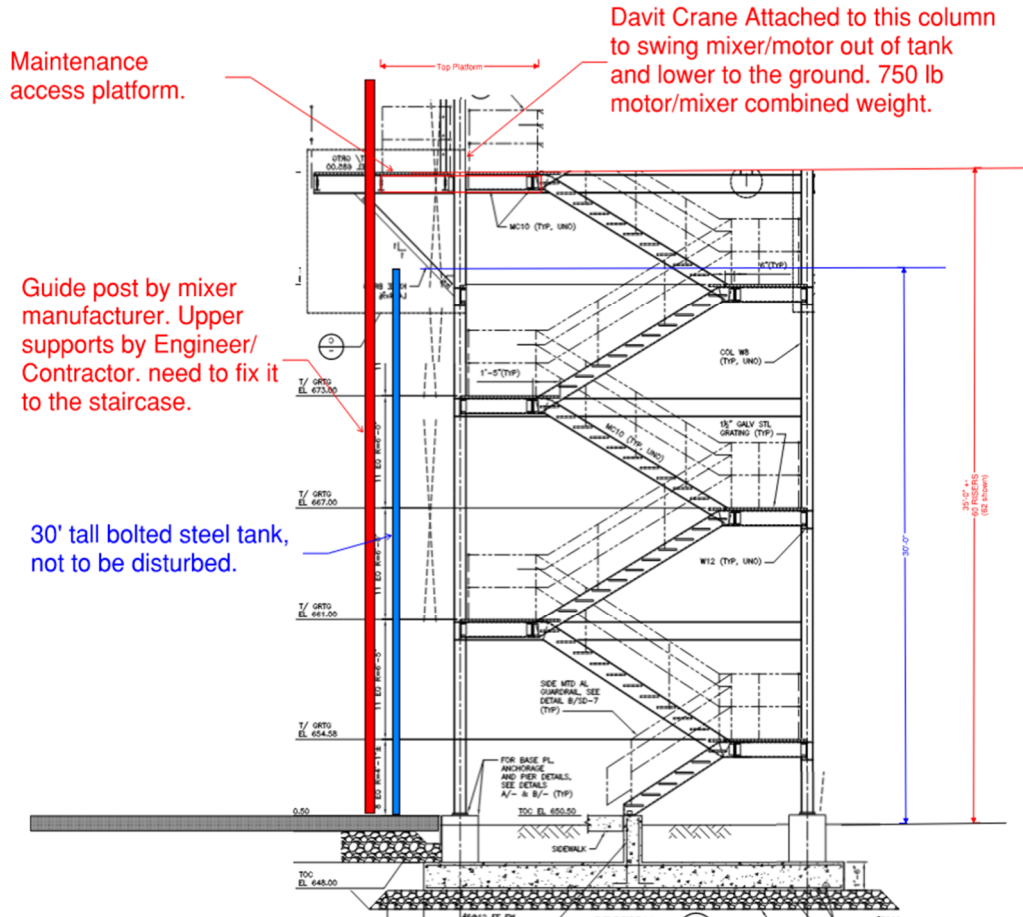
Conceptual Design of Maintenance Access Stair Tower
